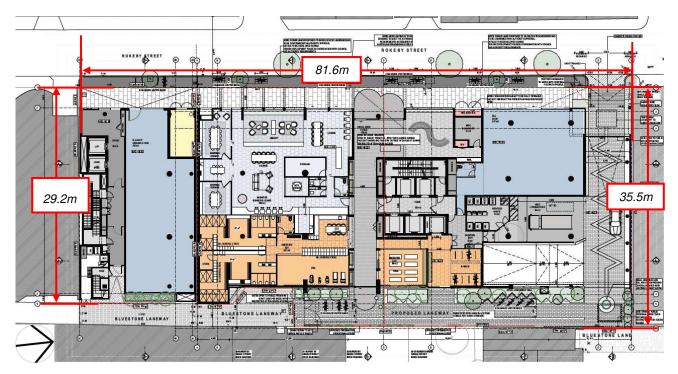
Ground floor plans with the plan-form dimensions overlaid.
